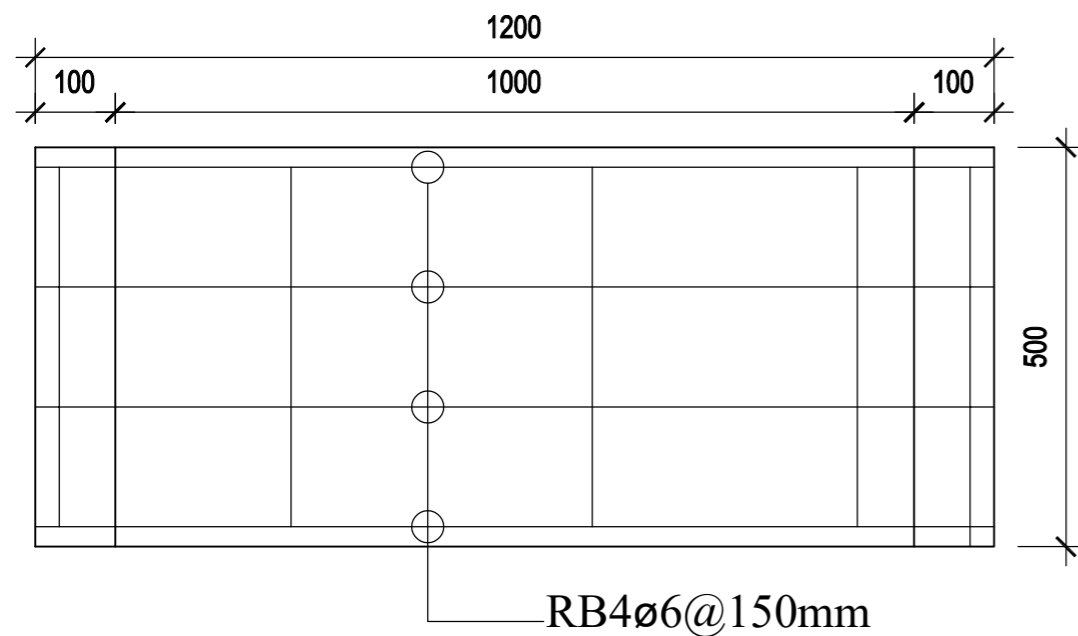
# DETAIL REINFORCEMENT FOR RC PIPE AND COVER
